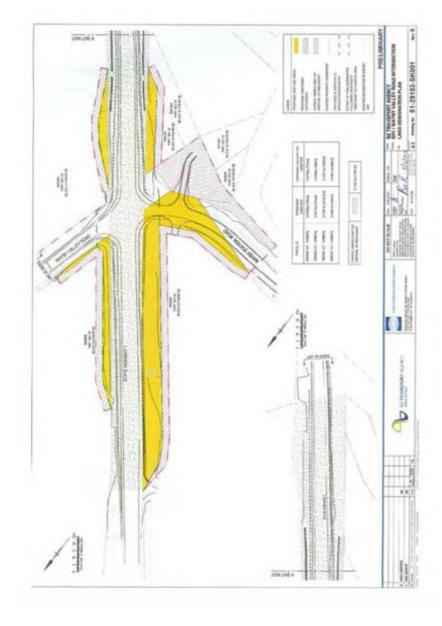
State Highway Wayby Road Intersection Land Designation Plan.
